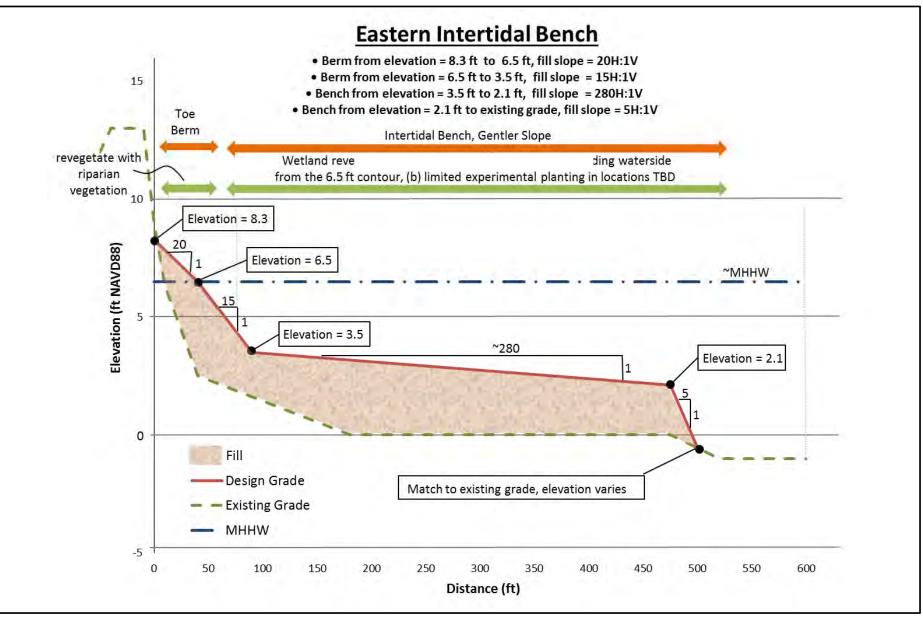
Eastern Intertidal Bench Typical Cross Section
